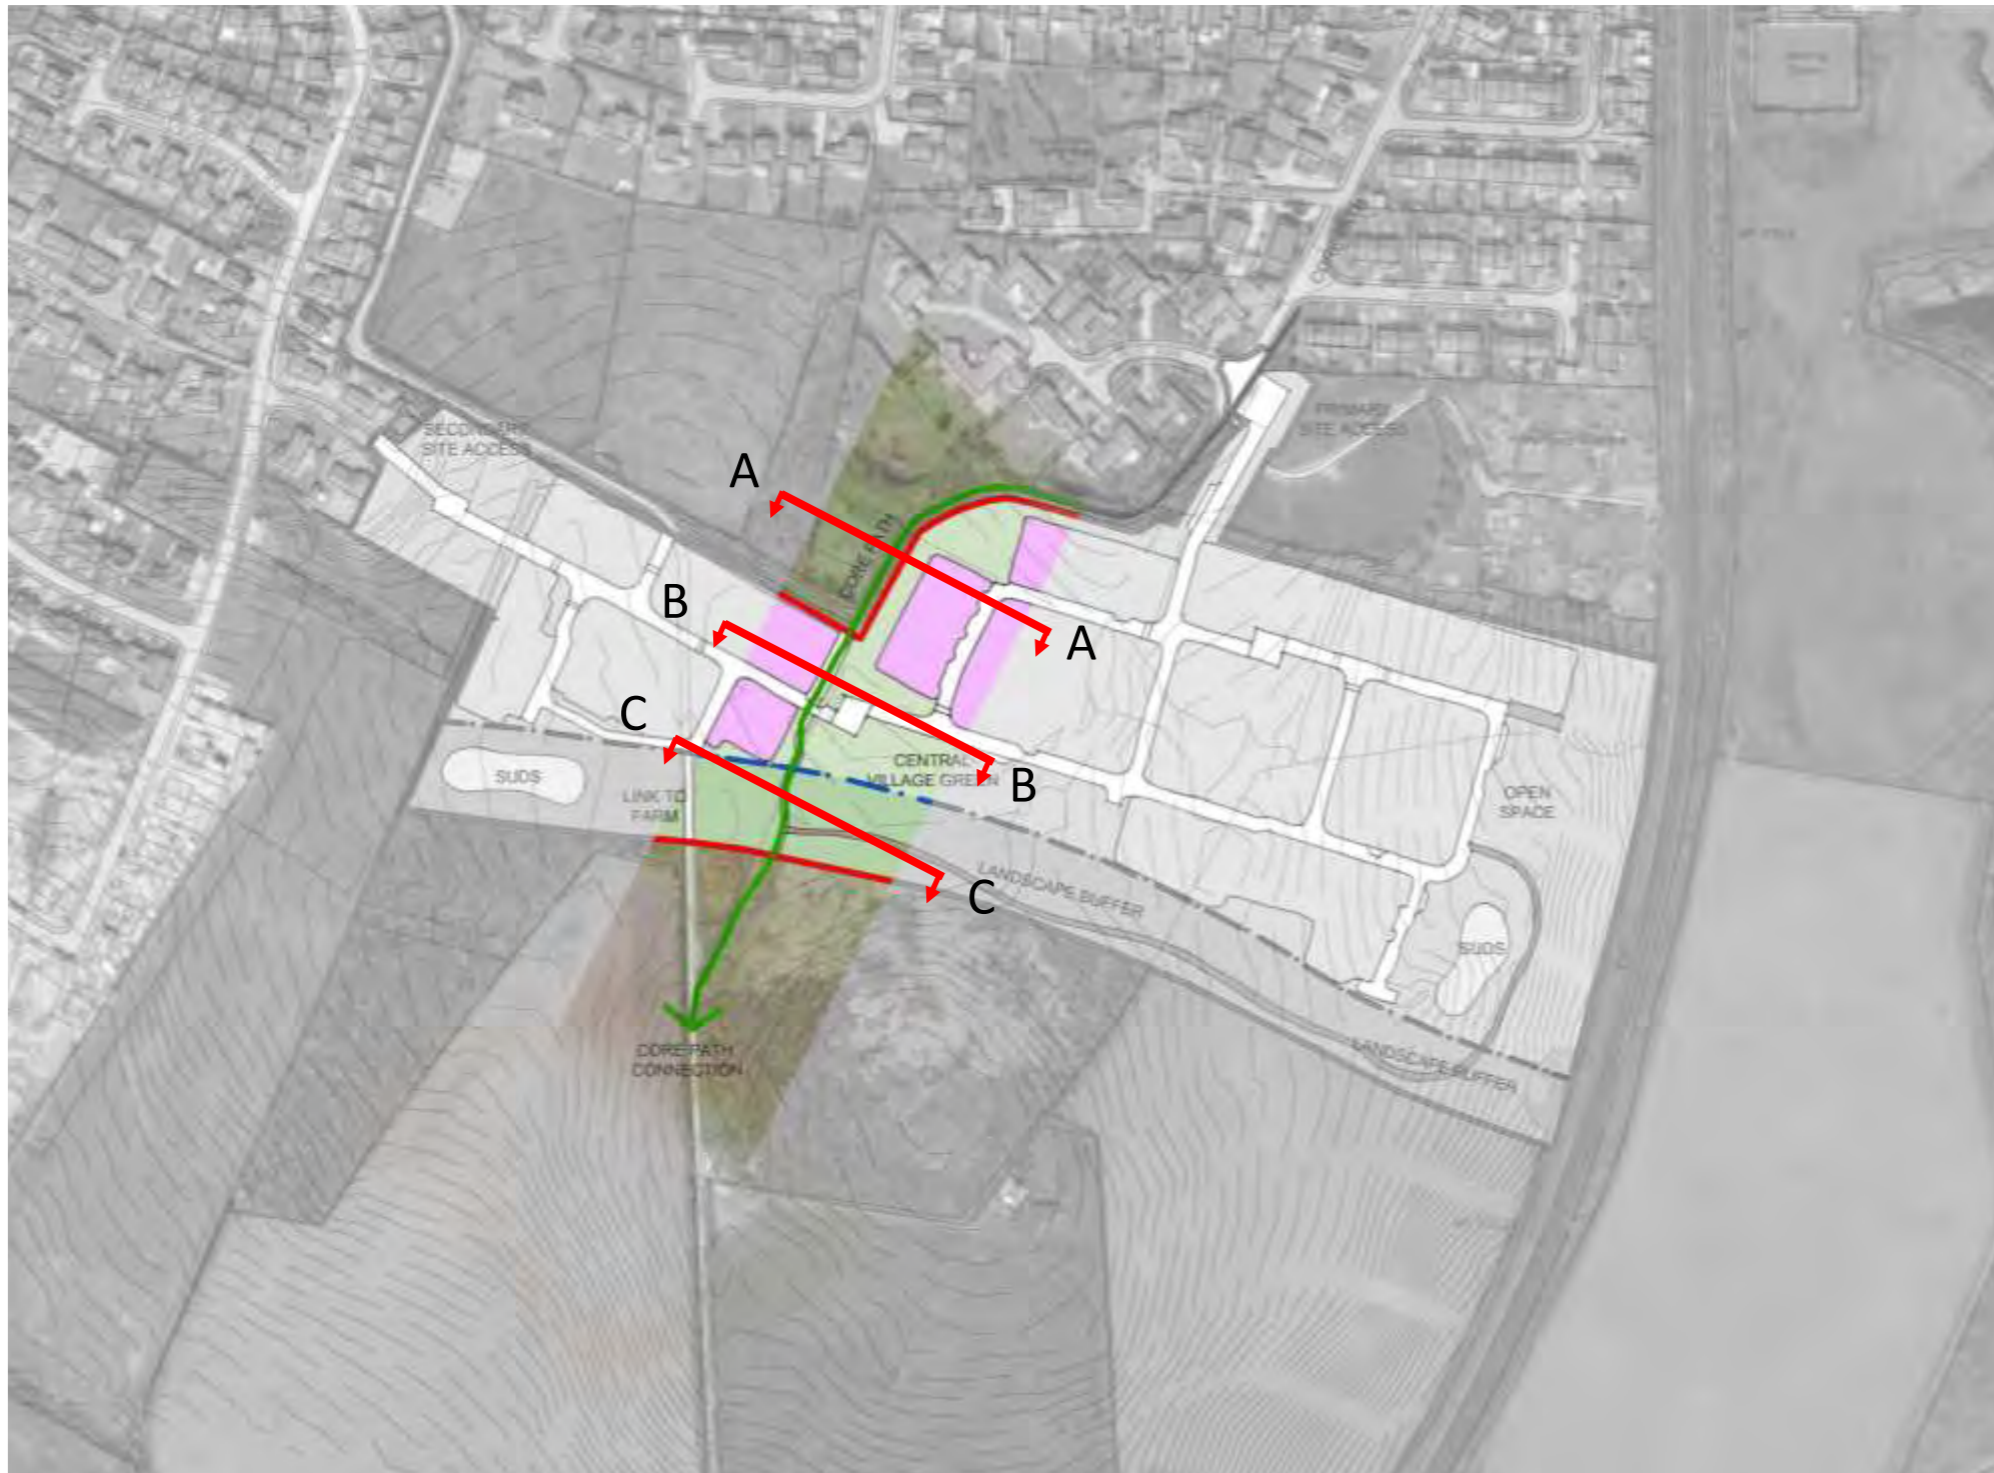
Diagram of key site plan showing location of sections of the Core Path.
